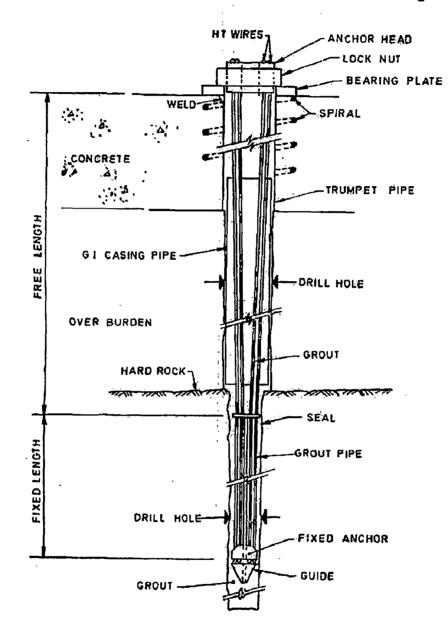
Prestressed Rock Anchor showing typical details (IS: 10270)
